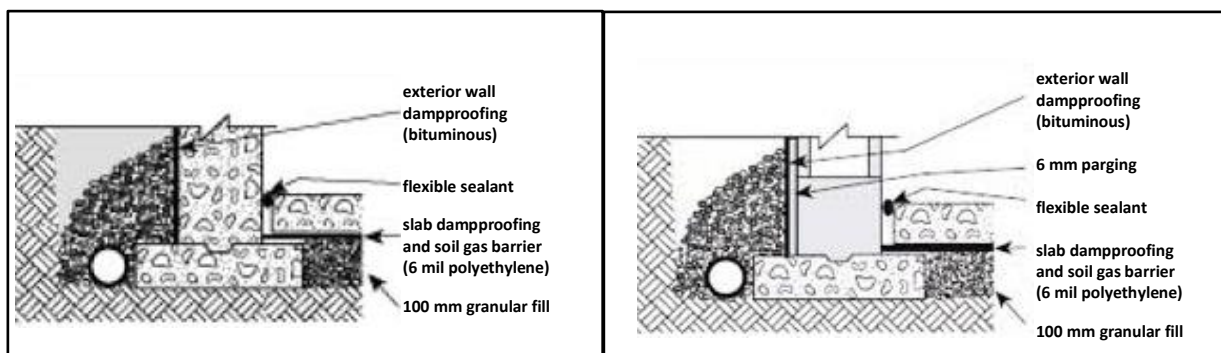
OPTION 1 with exhaust pipe adjacent to foundation wallOPTION 2: RADON GAS BARRIER
